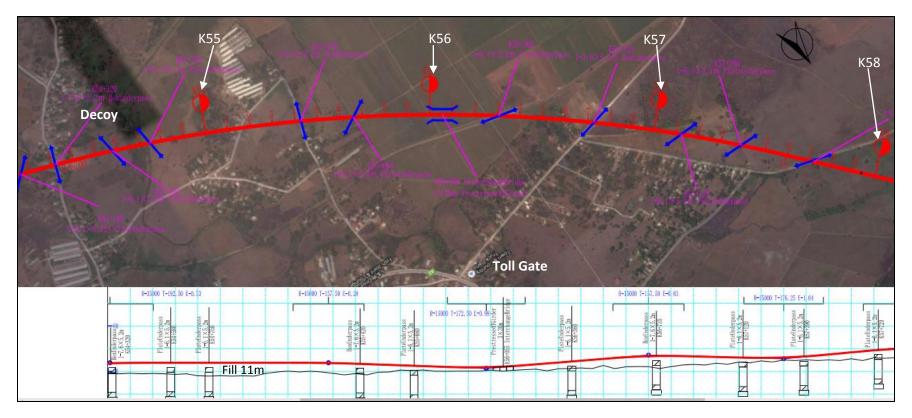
Proposed Road Gradient Profile which shows deep Fill of up to 11m to be placed as Road Fill for Highway Construction in the Decoy Area of Clarendon
